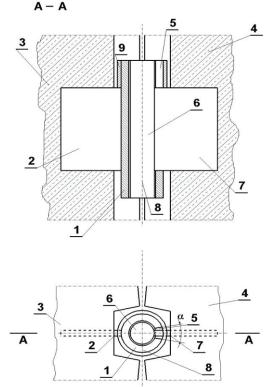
Articulated joint connection of prototype concrete barrier – coupler project: 1- thick-wall pipe; 2 and 7 connecting steel; 3 and 4 – concrete barrier segment; 5- cut-out in the thick-wall pipe, 6- internal bolt; 8- rotation axis; 9- protecting sleeve
